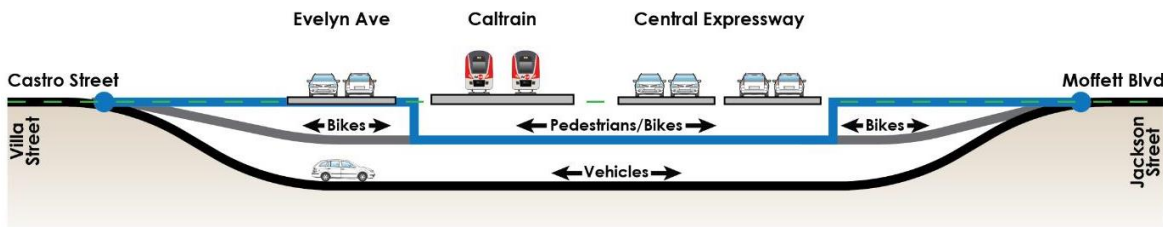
Alternative 1: Lower Castro Street and Moffett Boulevard
